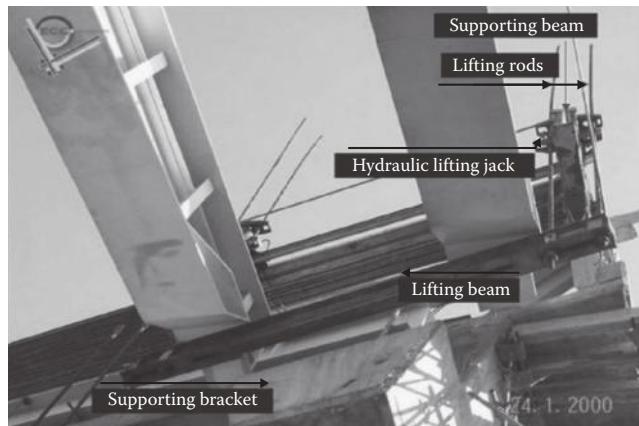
Steel beams after erection (El-Moneeb Bridge).
